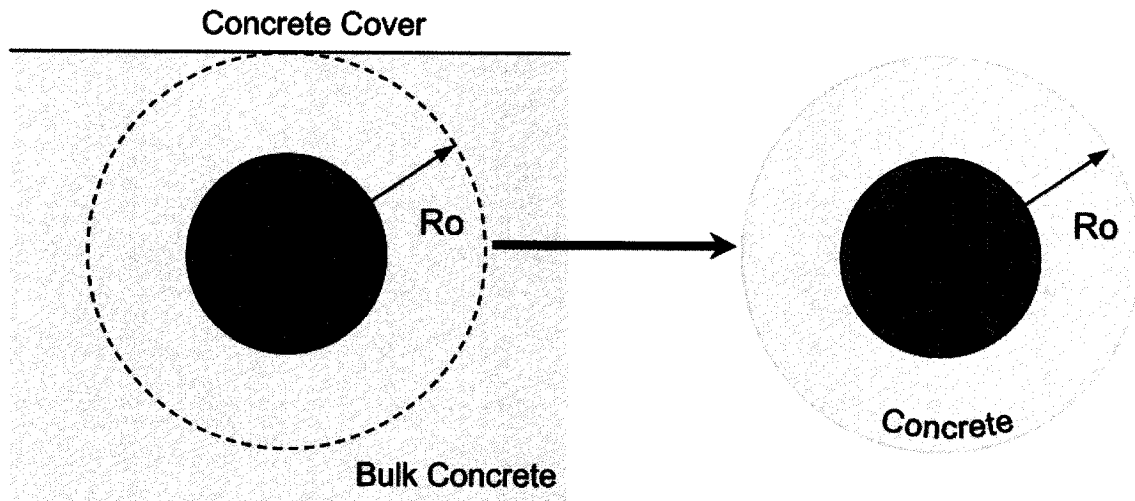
Translation of steel in bulk concrete medium to a thick walled concrete cylinder.
